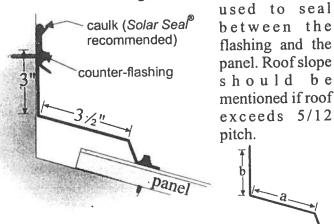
As with the ridge cap, the ENDWALL FLASHING above can be sealed using outside closures.
